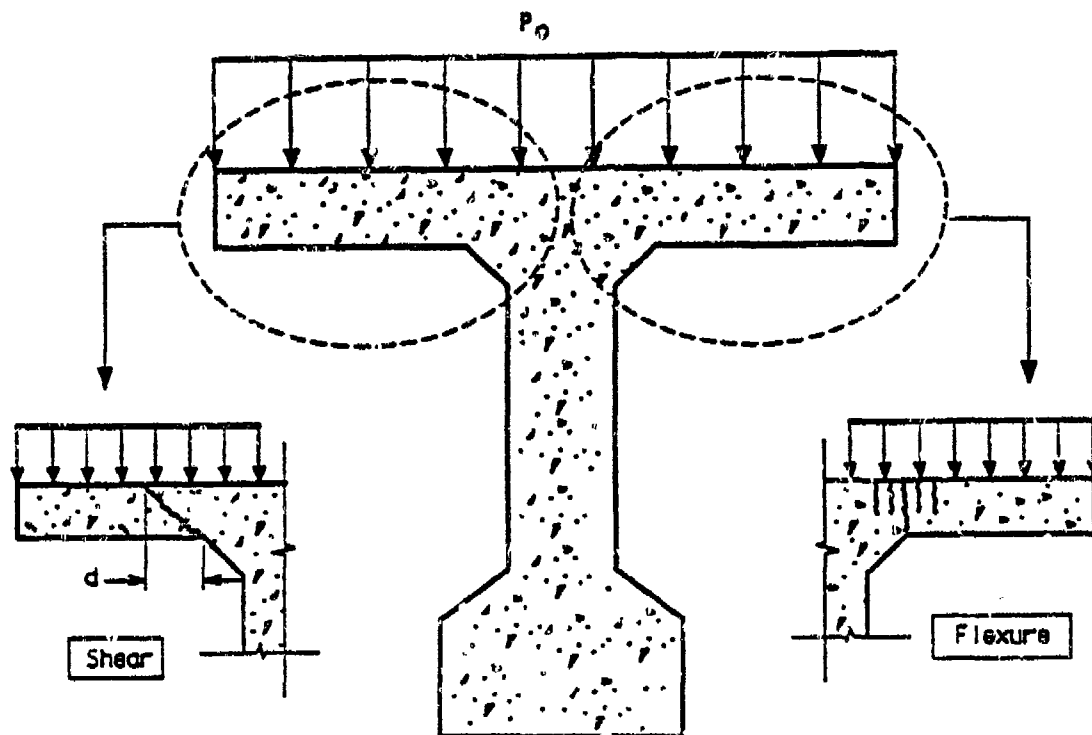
Transverse Shear and Flexural Failure Modes of Reinforced Concrete or Prestressed Slab.
